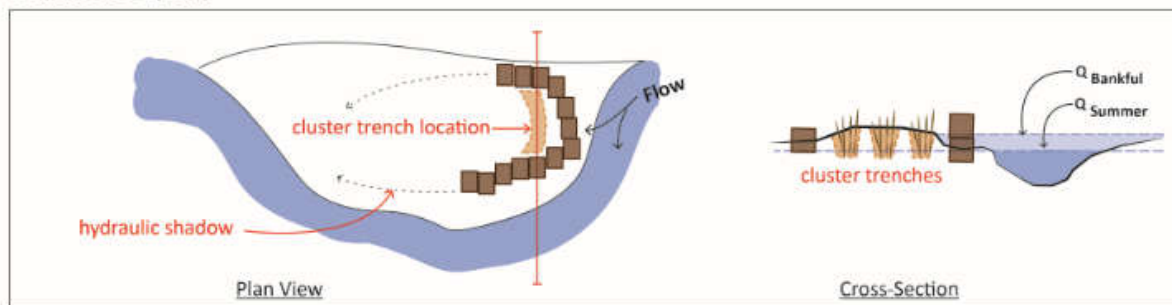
Caddis basket coarse flood deposit and cottonwood-willow cluster trench planting (see Section Appendix A for cluster planting details).
